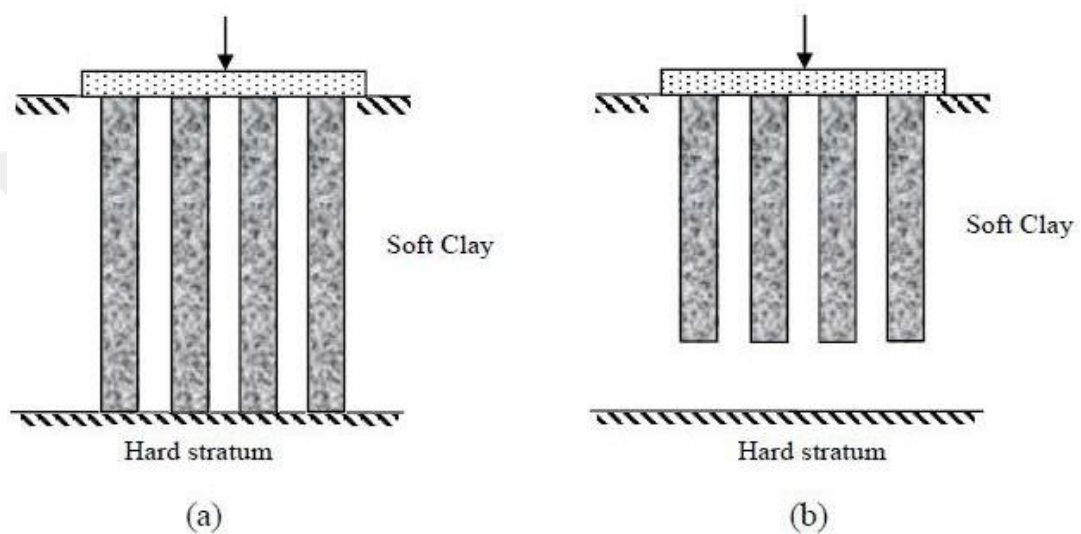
(a) End-bearing stone column. (b) Floating stone column.
